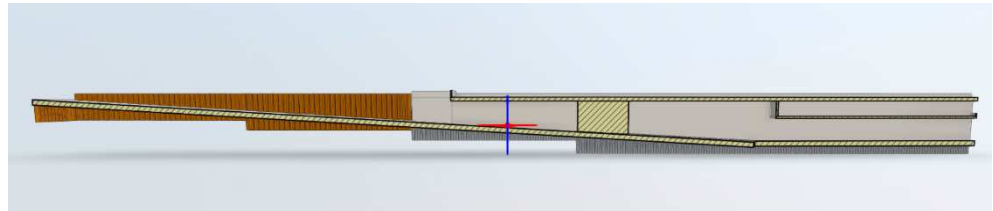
Long section of typical ramp structure (Note bifurcation not shown, length of cut and cover may vary).
